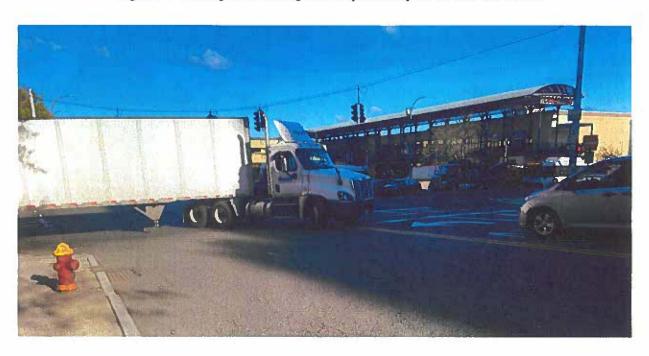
Existing Truck Turning onto Prospect Street from NB Riverdale Avenue
